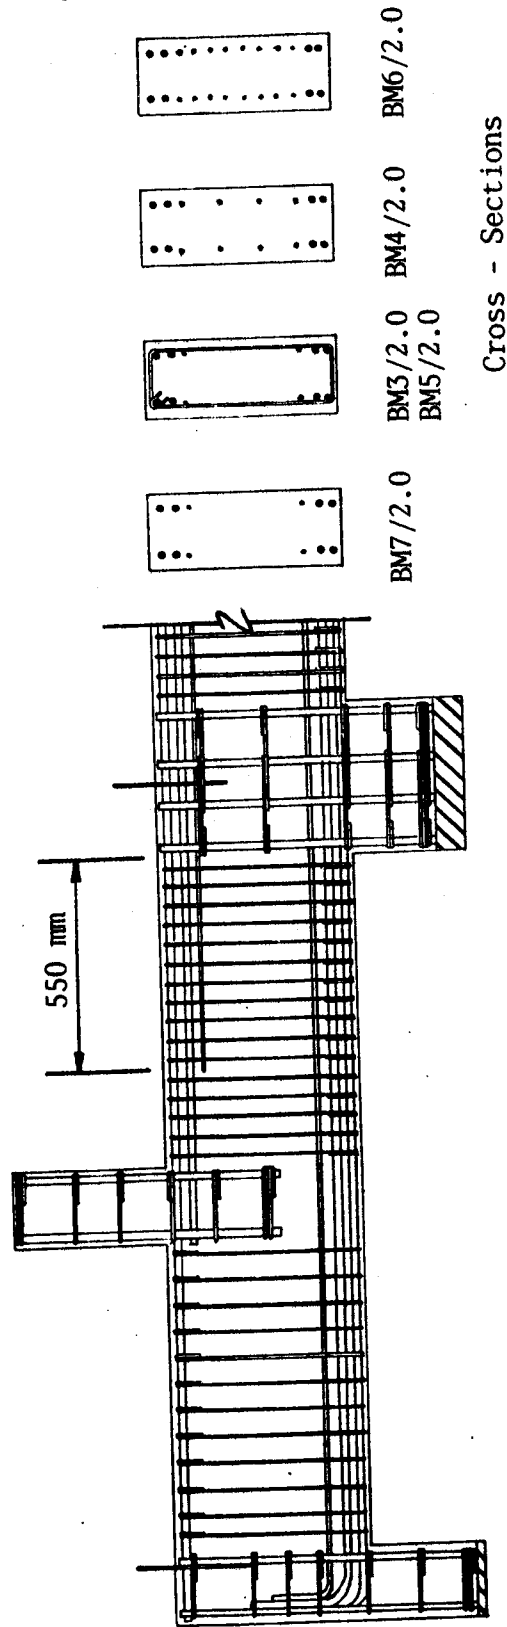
Beam 3/2.0, 4/2.0, 5/2.0, 6/2.0, and 7/2.0 Reinforcement Details
